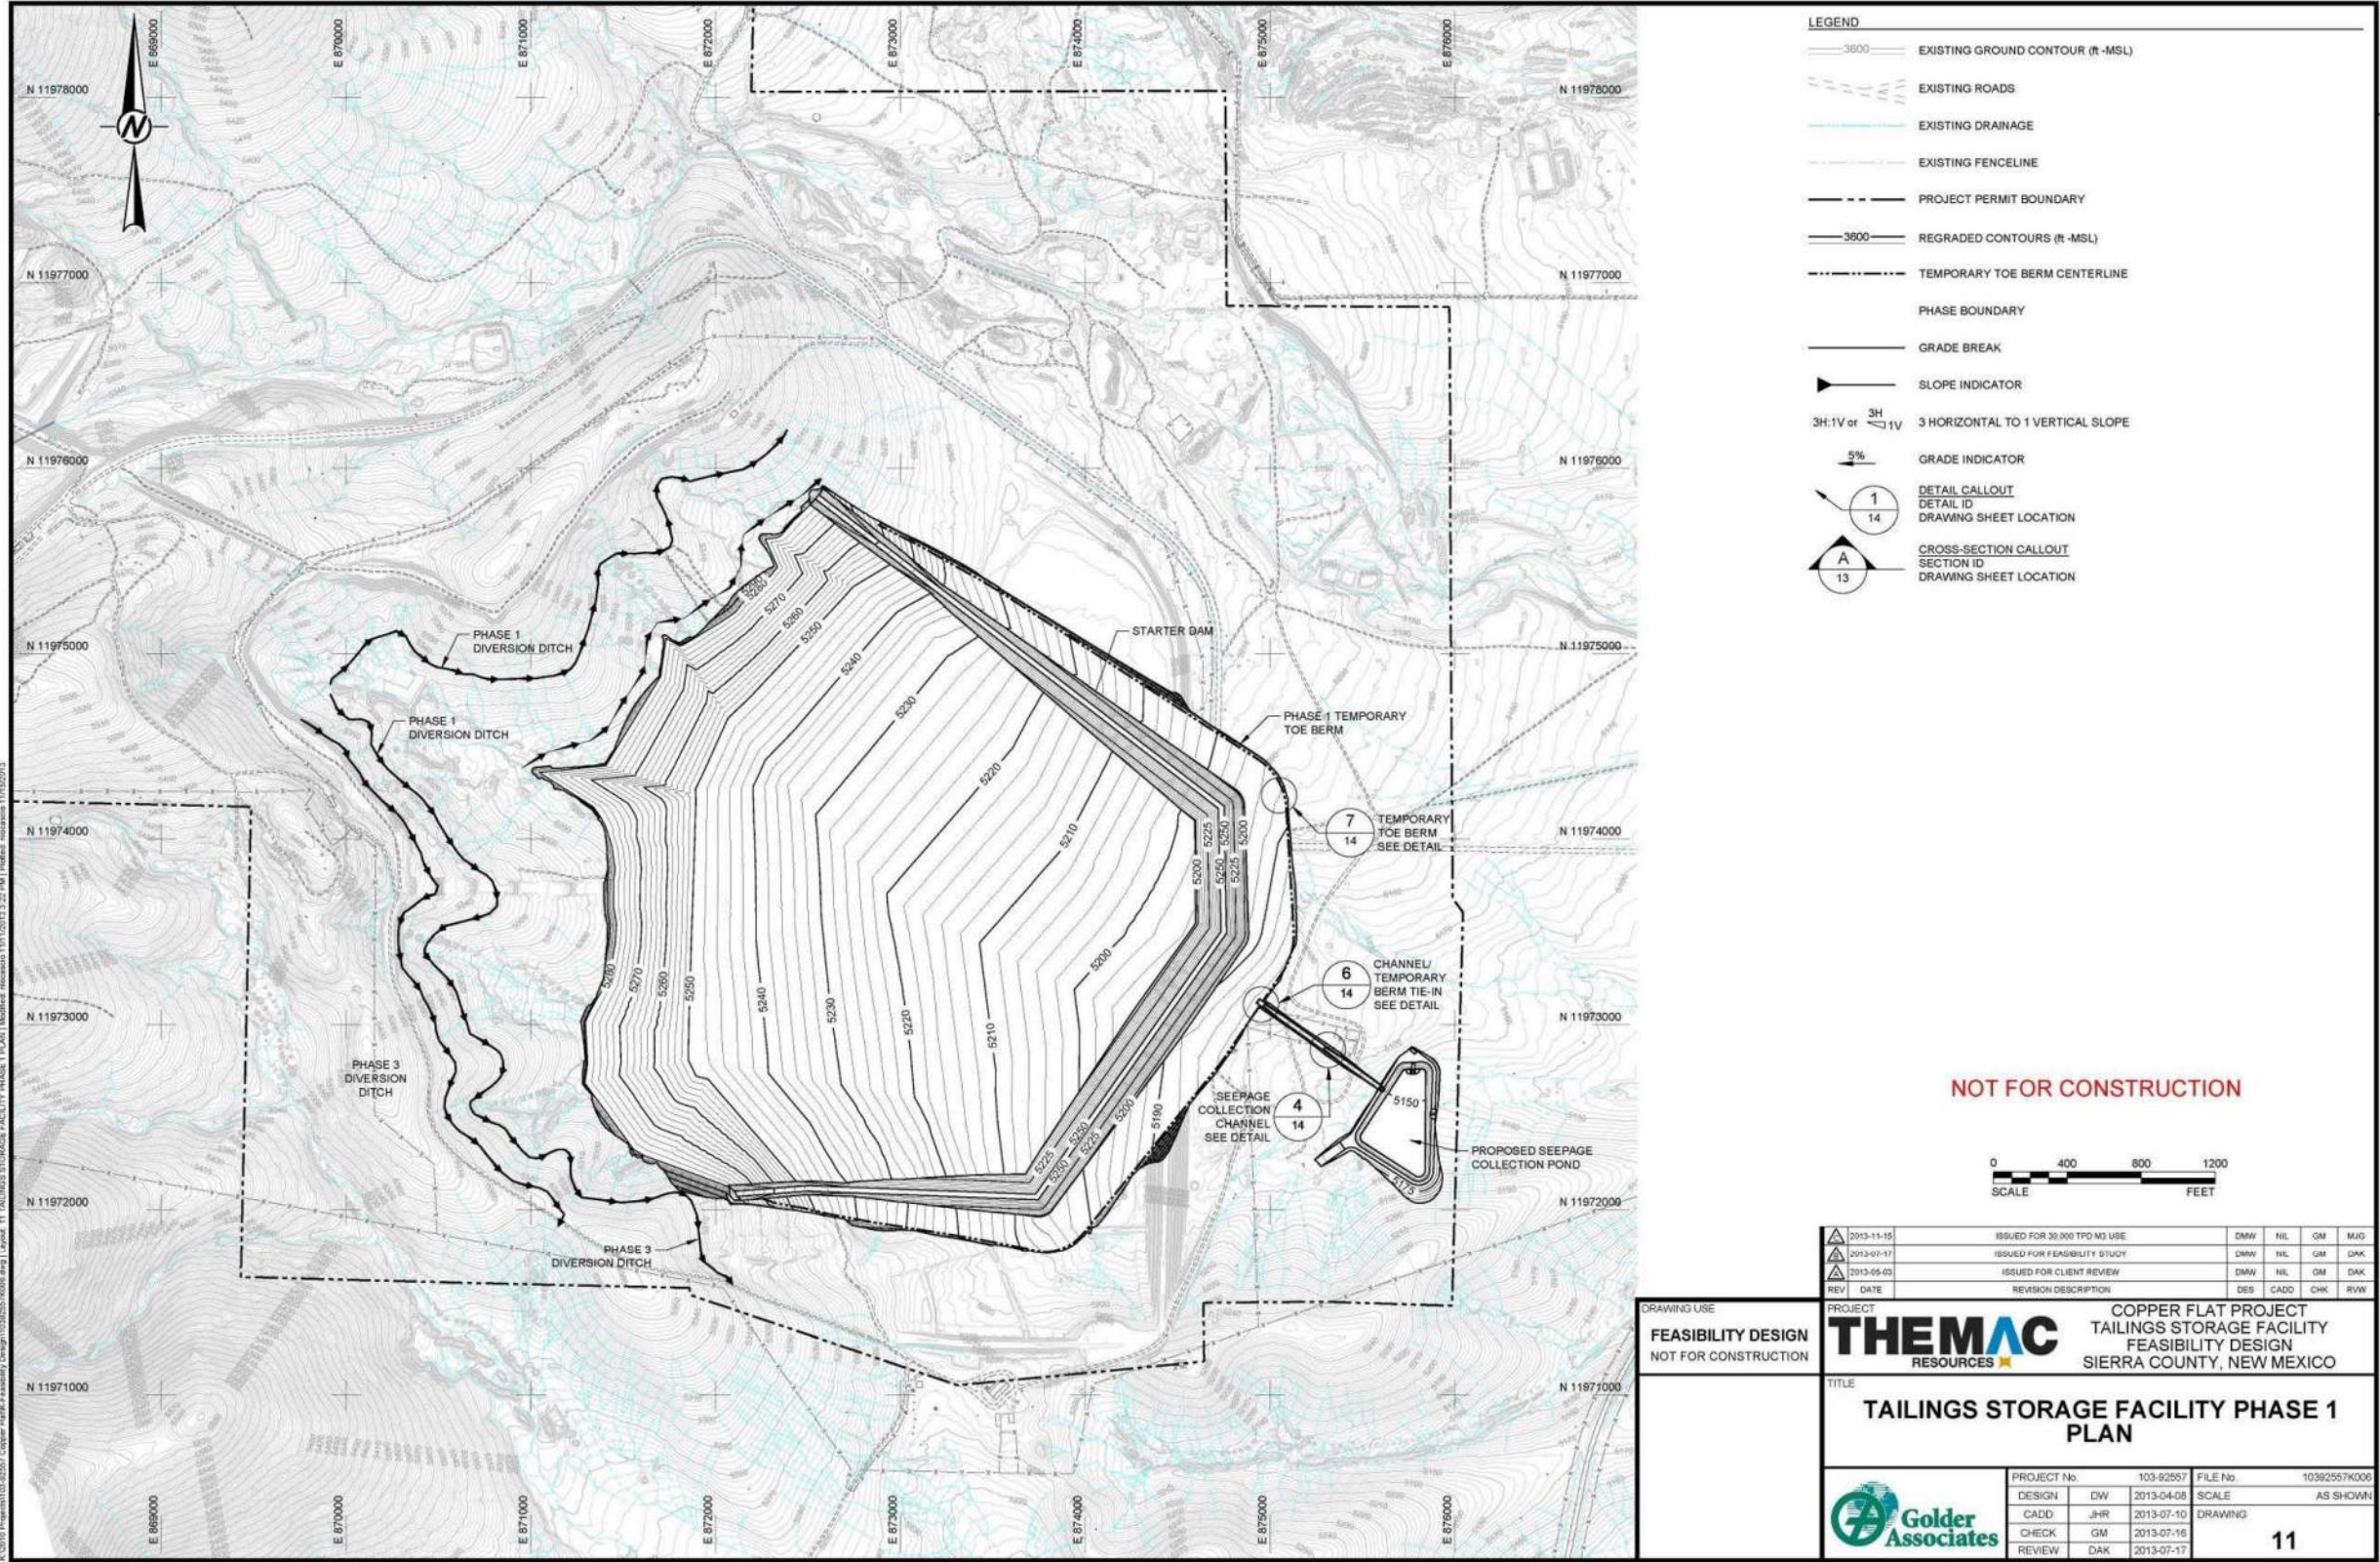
Tailings Storage Facility Grading Plan Phase 1
